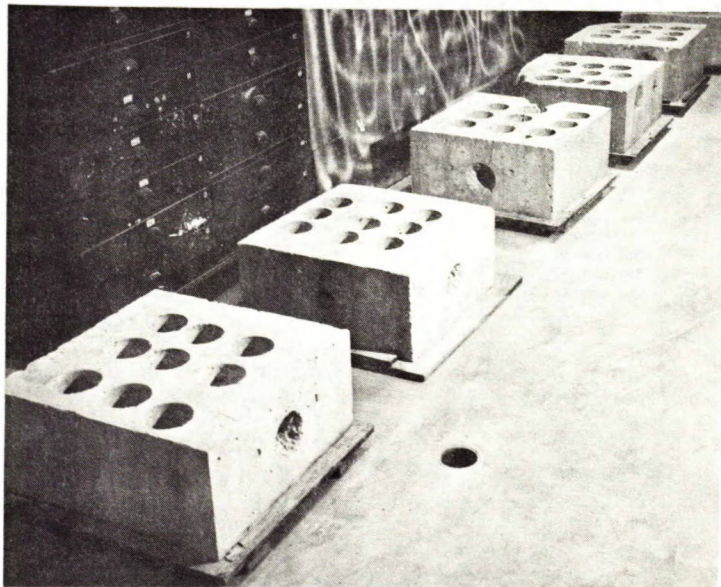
A view of 24x24x12-in. (610x610x305-mm) concrete blocks after tests.
